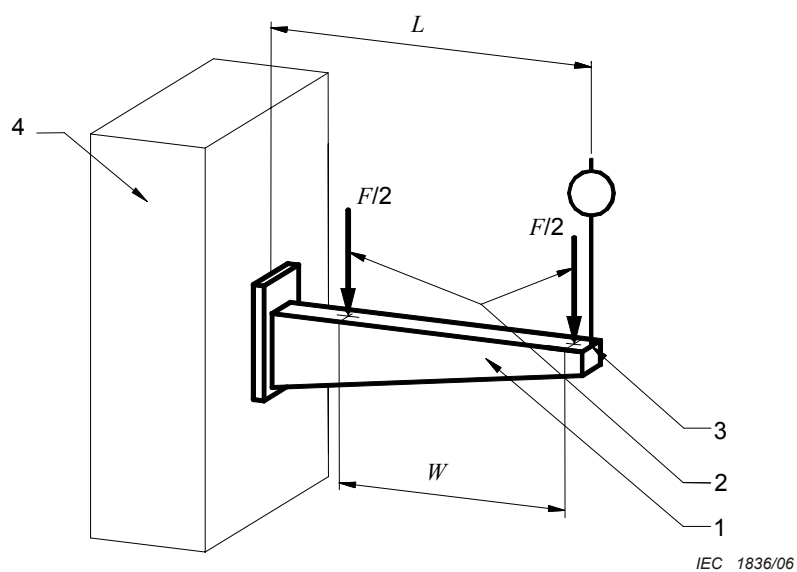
Test set-up for pendant fixed cantilever bracket designed for supporting cable tray systems or cable ladder systems
